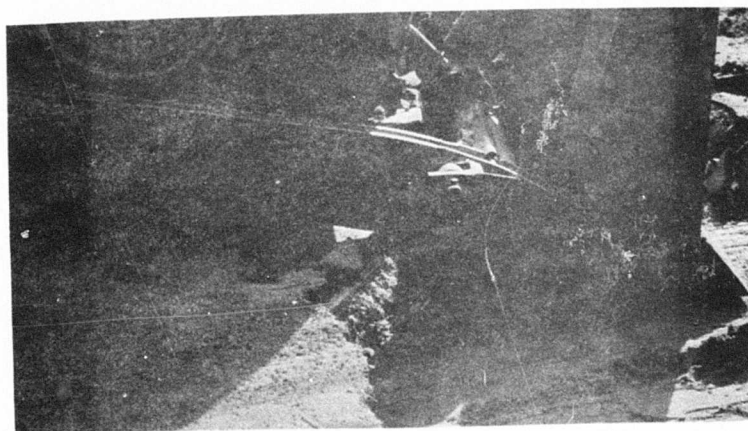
Test 1-2, Ripper Tooth Deployed and Lifting Upheaved Pavement
